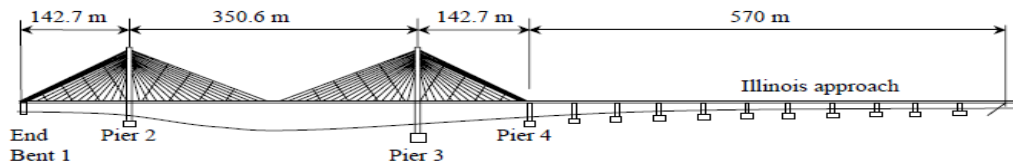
Schematic view of the Bill Emerson Memorial Cable-stayed Bridge [10]
